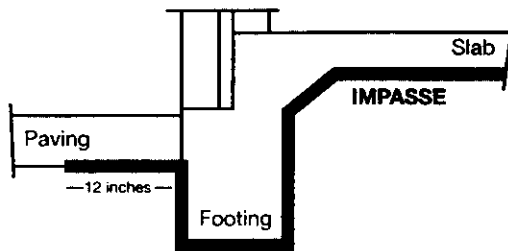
Shows Impasse Barrier installed as a perimeter treatment beneath concrete or pavers.
